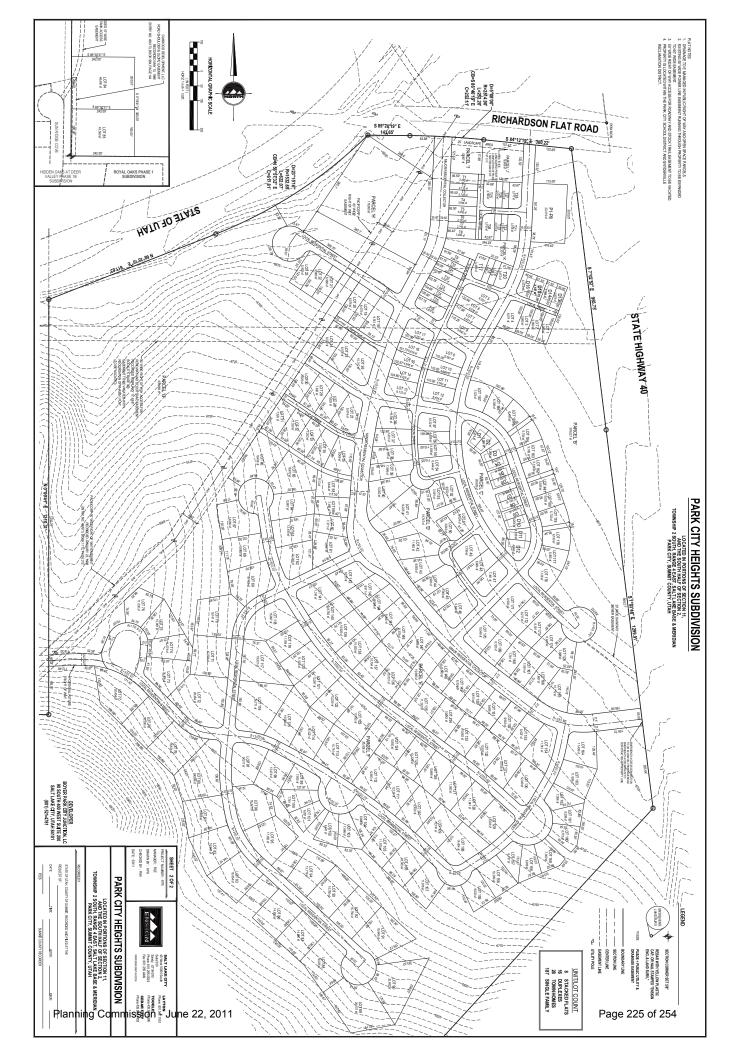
Exhibit A- Preliminary subdivision plat, grading and drainage plan, utility plan, roadway cross sections, erosion control, and phasing plan.
